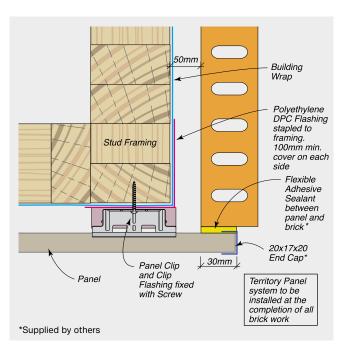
Internal Corner Junction Panel/Bond Wall
